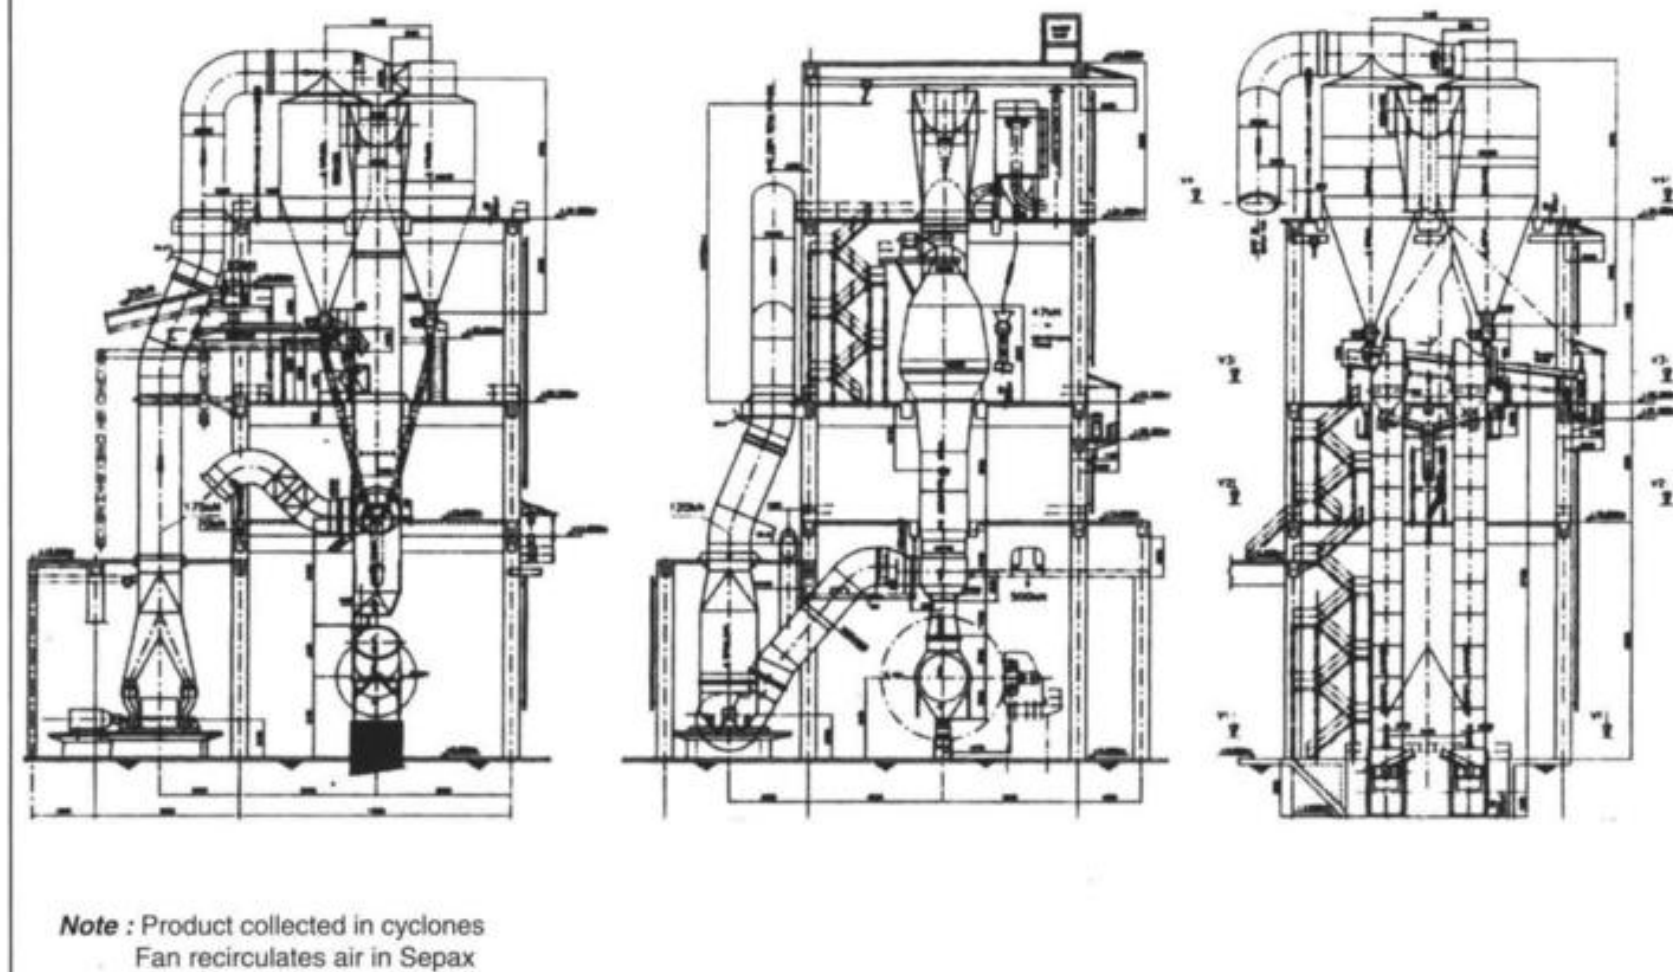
Ball mill and sepax separator in raw material grinding system.
